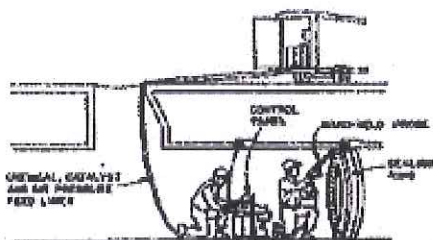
Typical arrangement for sealing large diameter pipe with grouting rings.
